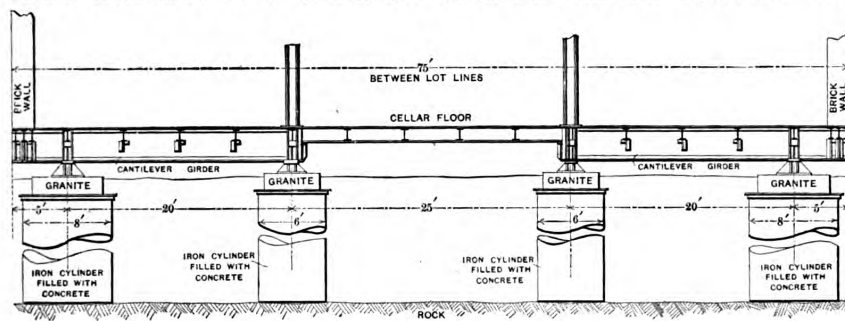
Cantilevers Supported by a Series of Cylinders or Caissons Filled with Concrete.
